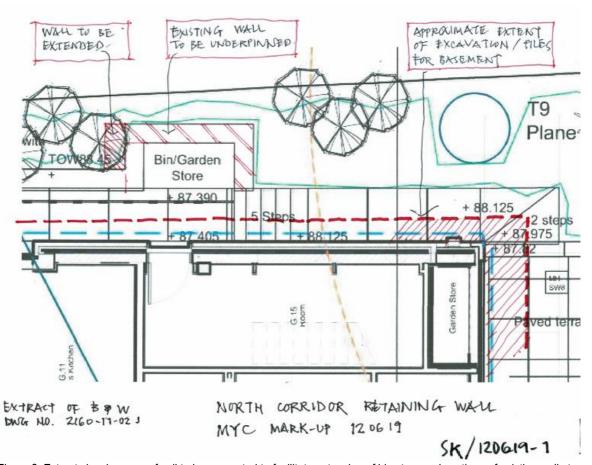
Extract showing area of soil to be excavated to facilitate extension of bin store and sections of existing walls to be underpinned
